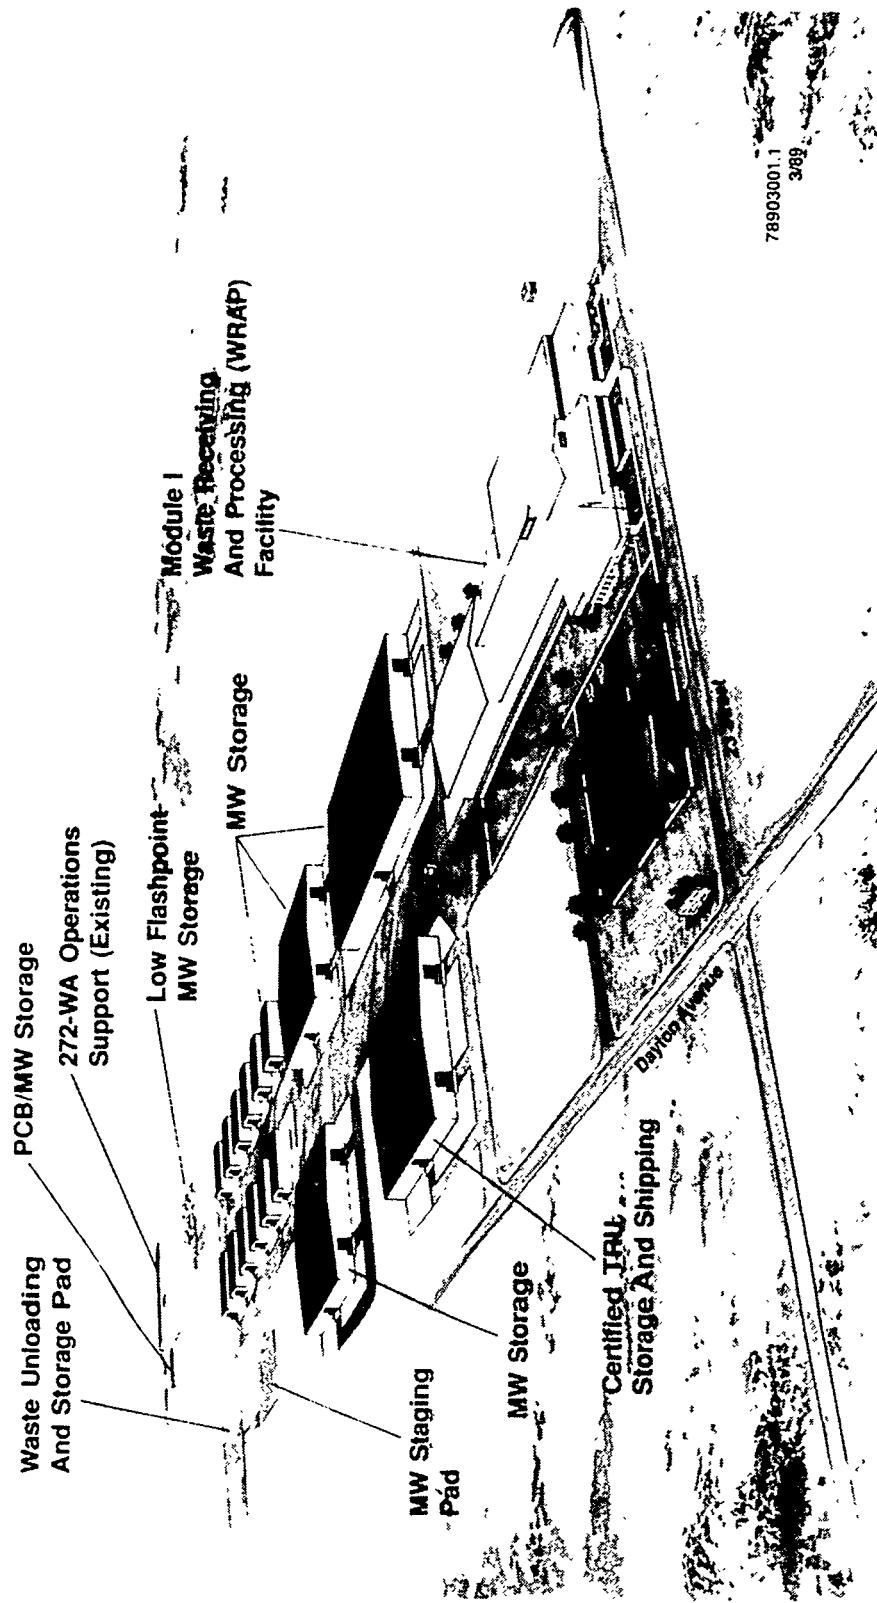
Hanford Central Waste Complex Conceptual Layout.
